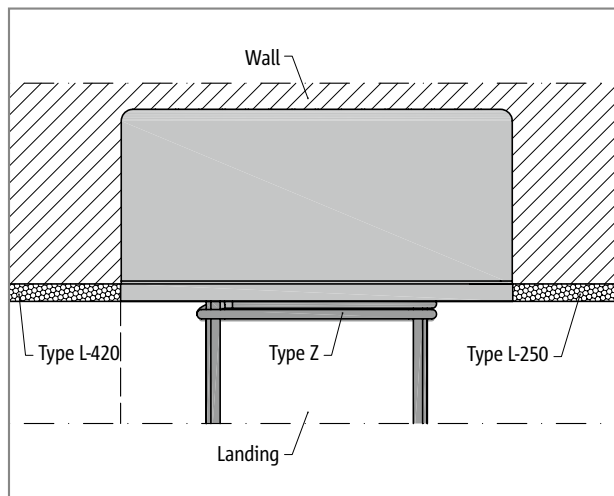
Schöck Tronsole® type Z: Element configuration, Detail A
